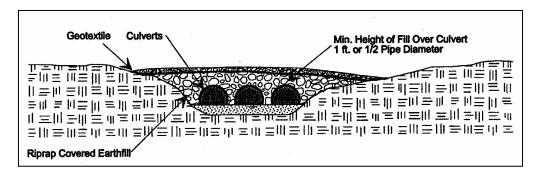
Typical Temporary Culvert Stream Crossing
